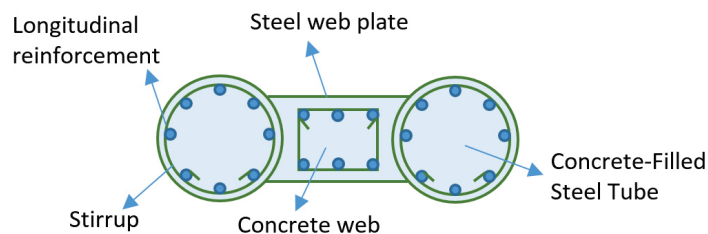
Dumbbell steel tube confined reinforced concrete pier design, highlighting innovative structural reinforcement techniques (adapted from Zhou et al. (2020) [176]).
